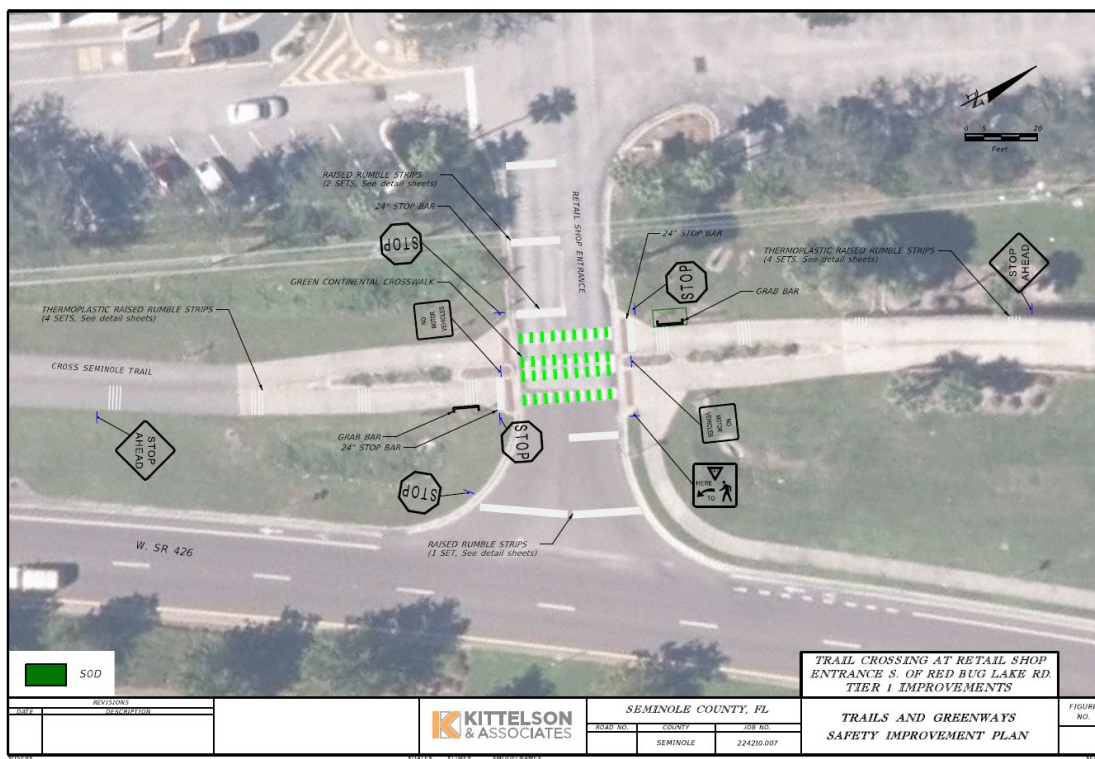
Tier I Improvements at Red Bug Lake Road Retail Center
